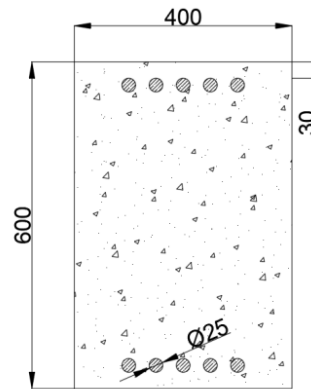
Dimension drawing of truss member with 400 mm × 600 mm section (unit: mm)
